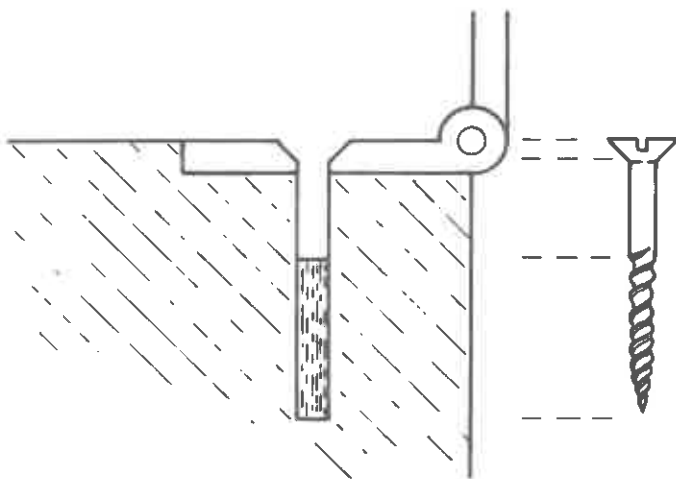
A dowel of softwood used to fill a worn screw hole on a hinged section. Note the screw thread only will enter the wood plug.
